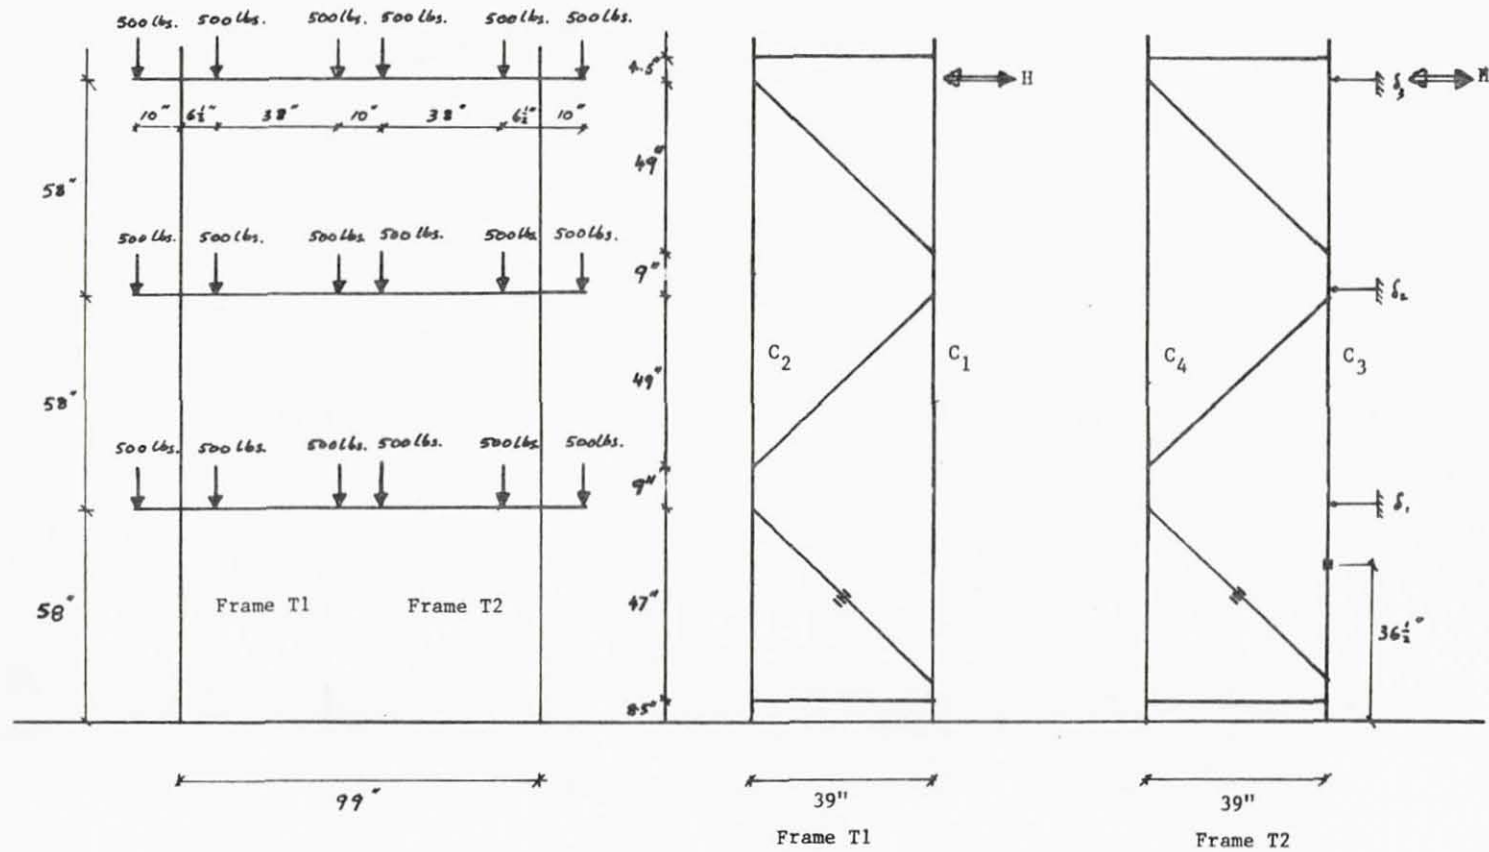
Loading Summary and Instrumentation -- Test B-R-2
